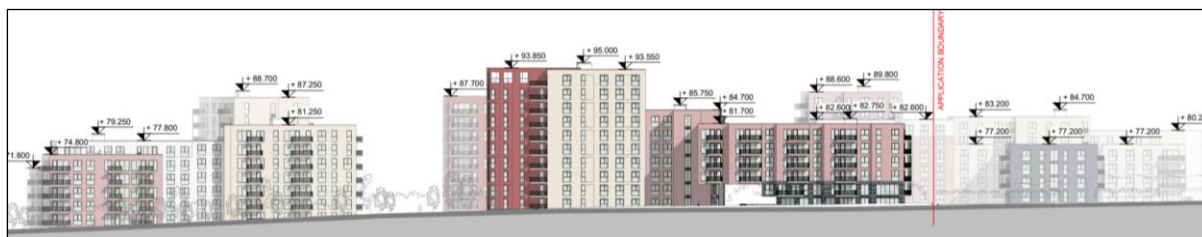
Proposed contextual elevation of development as viewed from the Greenhills Road.
